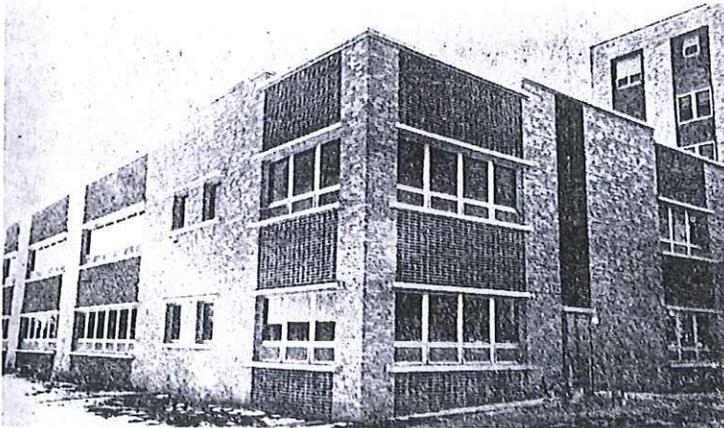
View of new Long-Term Care facility near completion, the new east wing, *Topeka State Journal* 27 December 1963.
